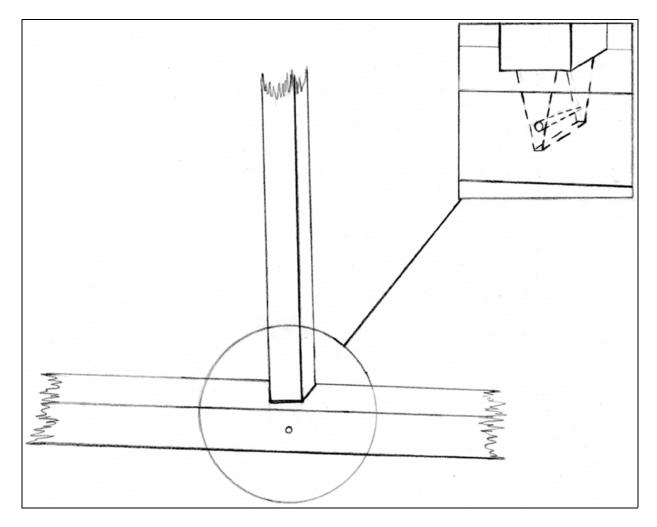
Post-on-sill (*Poteaux-sur-solle*) construction consists of uprights or posts, which are mortised into a sill (Drawing by Karin Hahn).
